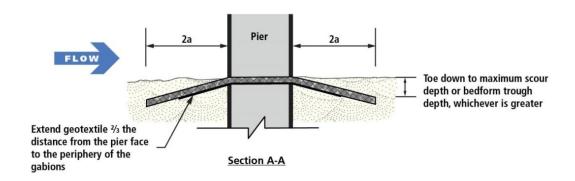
Gabion Mattress Layout Diagram for Pier Local Scour Counter Measures
